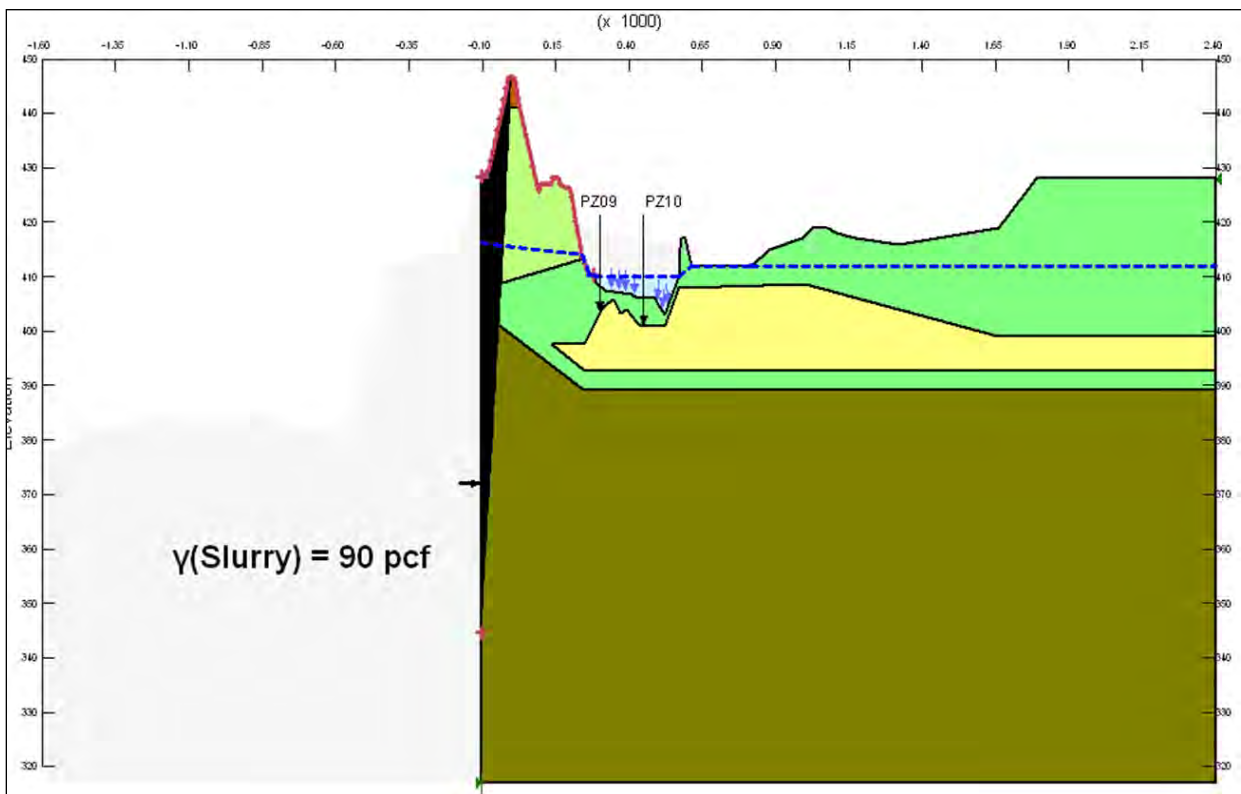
Slurry Trench Stability Sta 66+10 (FS = 1.34)
